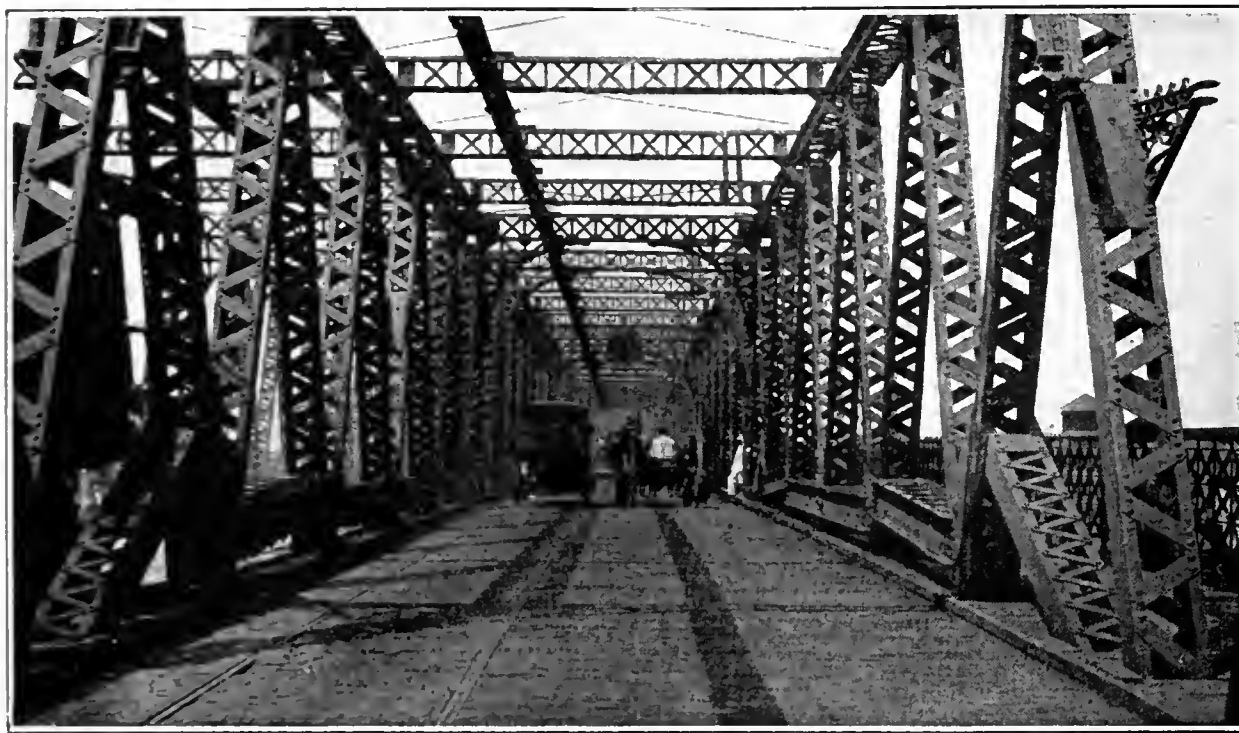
SPAN OF TWELFTH STREET VIADUCT, CHICAGO, REINFORCED BY ADDING BOTTOM CHORDS ABOVE THE FLOOR
